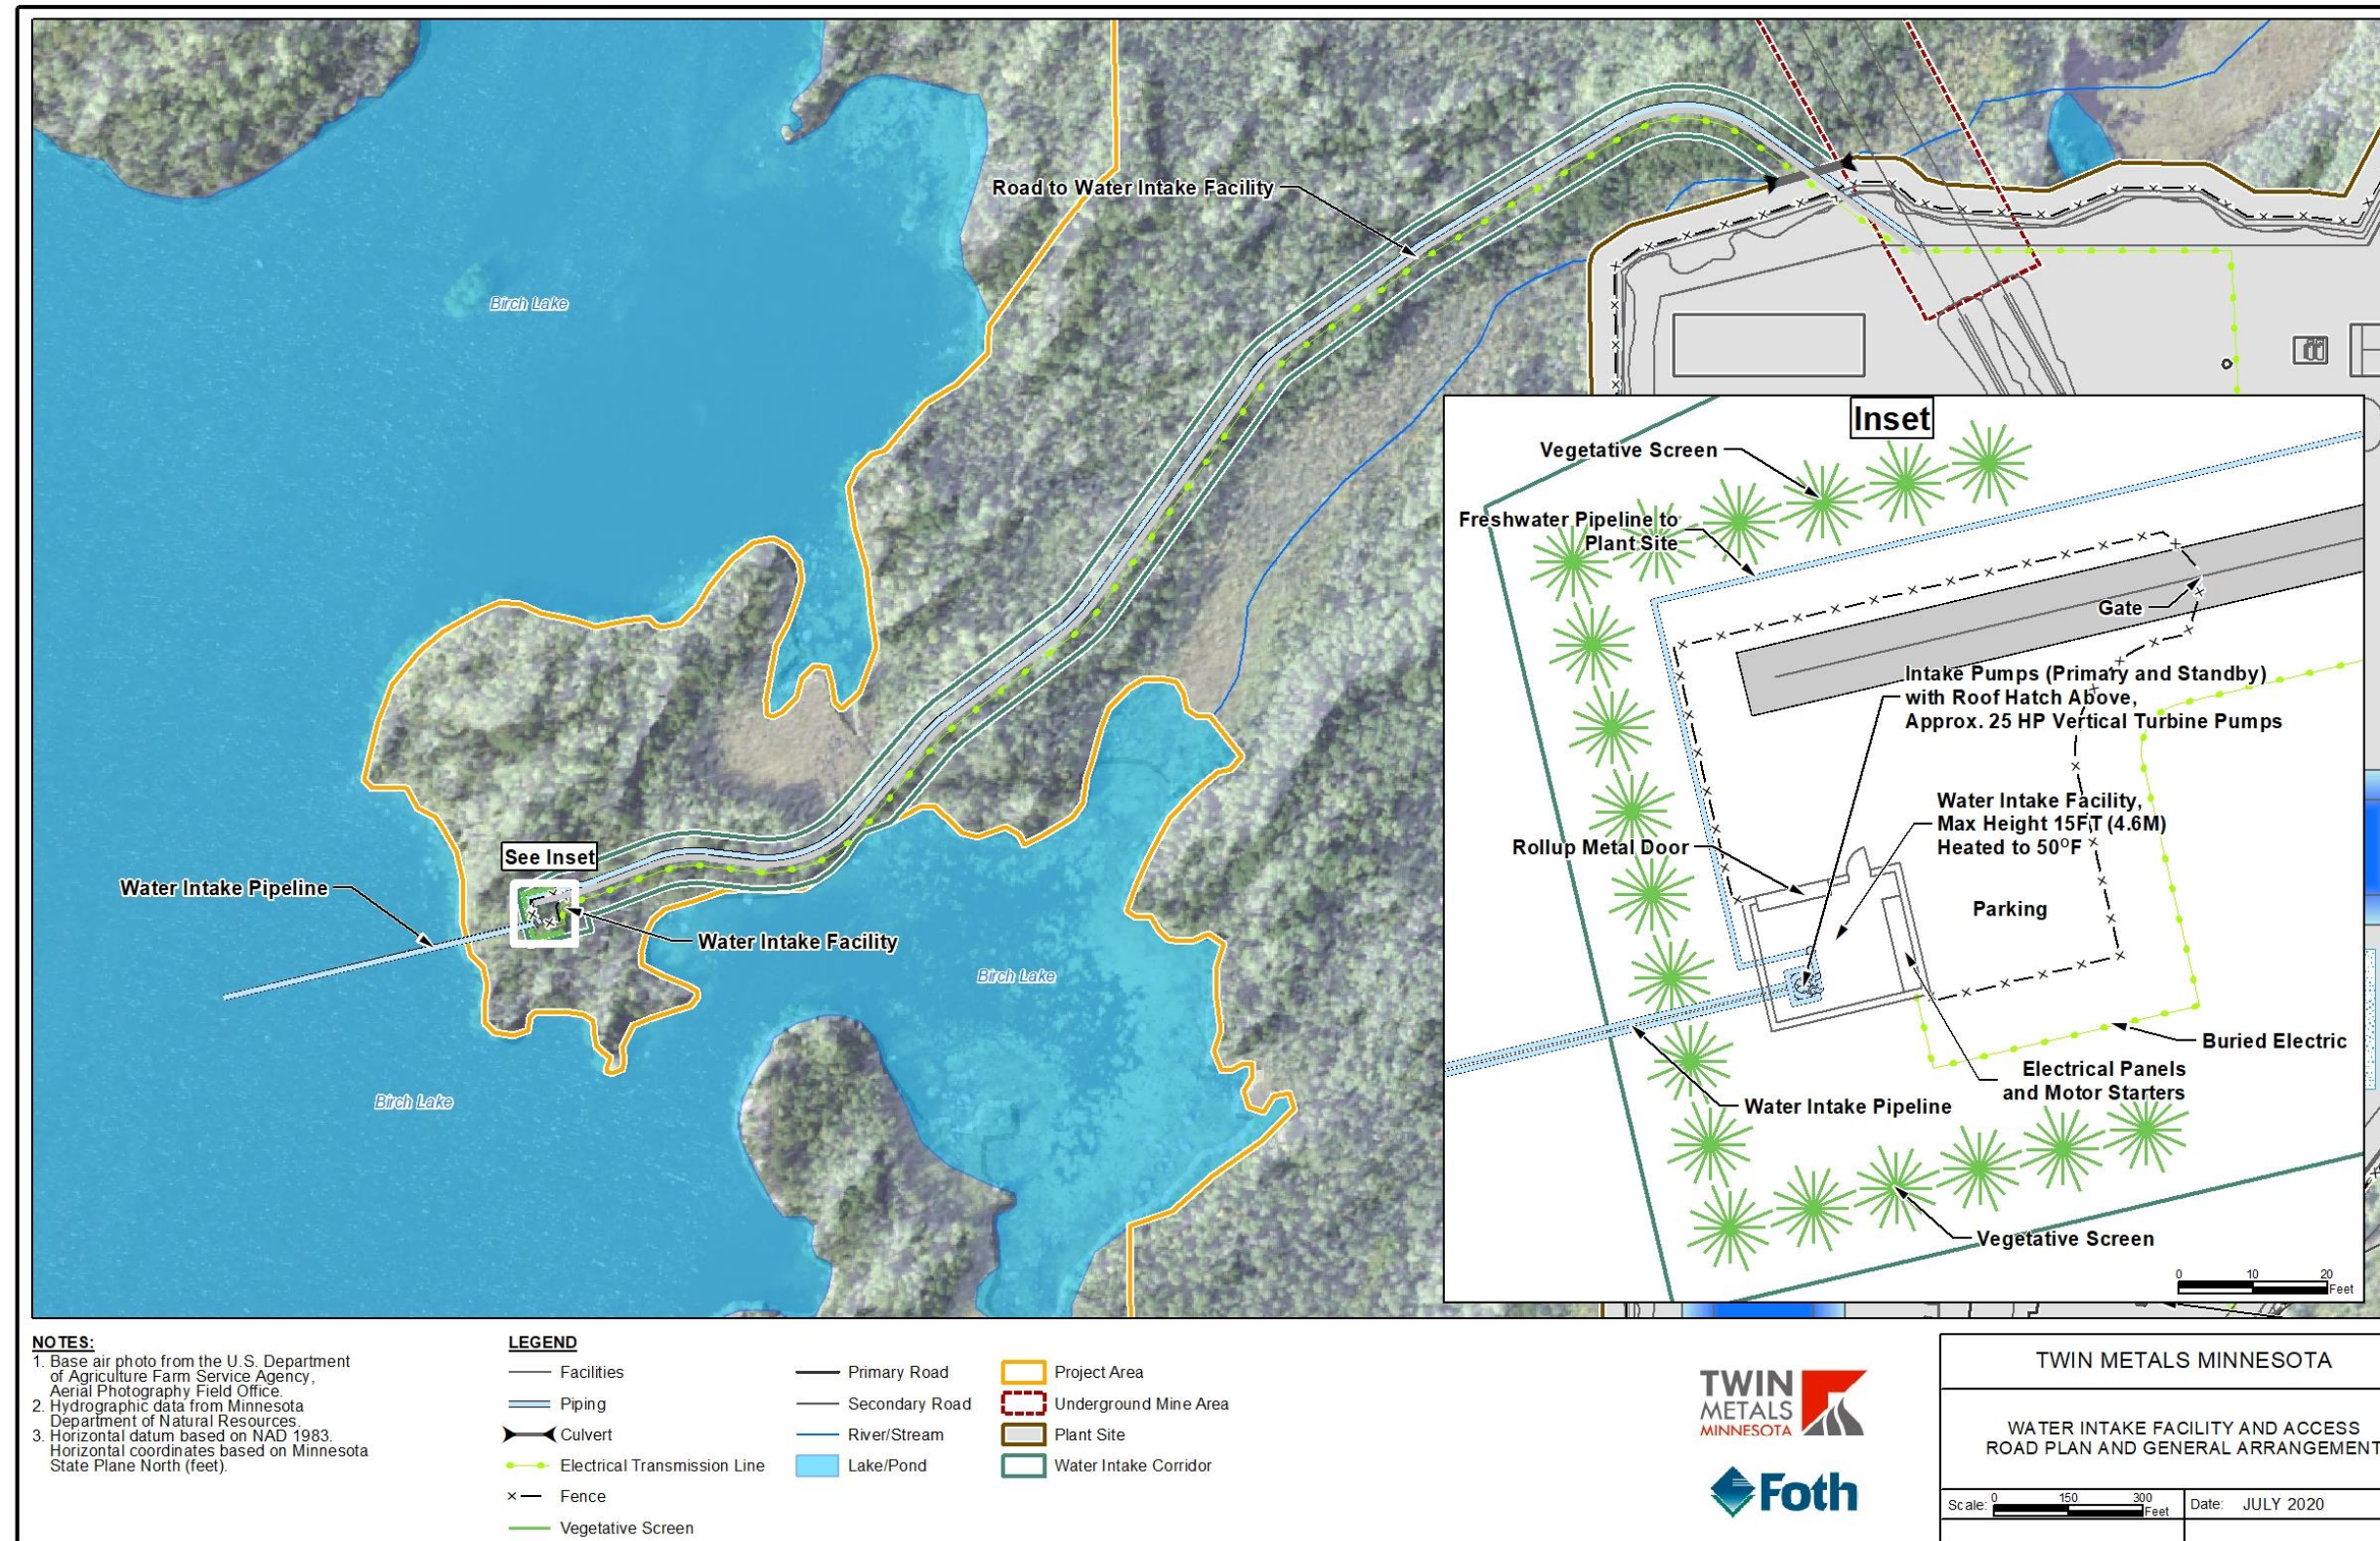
Water Intake Facility and Access Road Plan and General Arrangement
